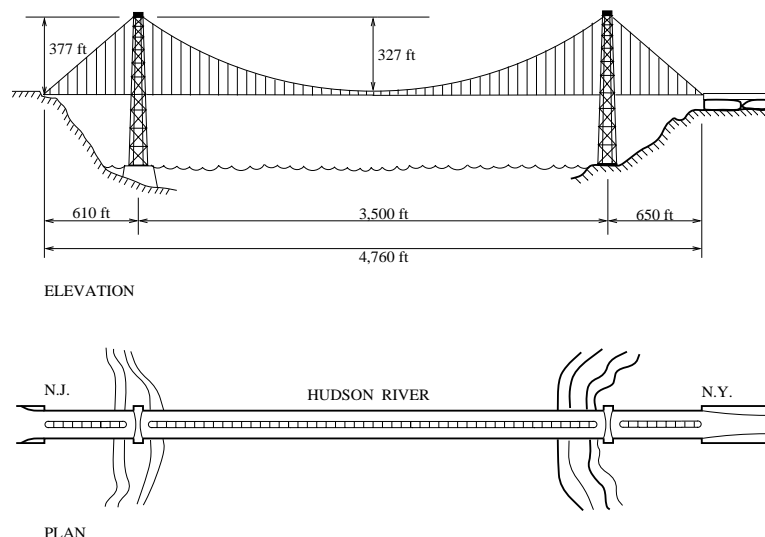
Longitudinal and Plan Elevation of the George Washington Bridge
